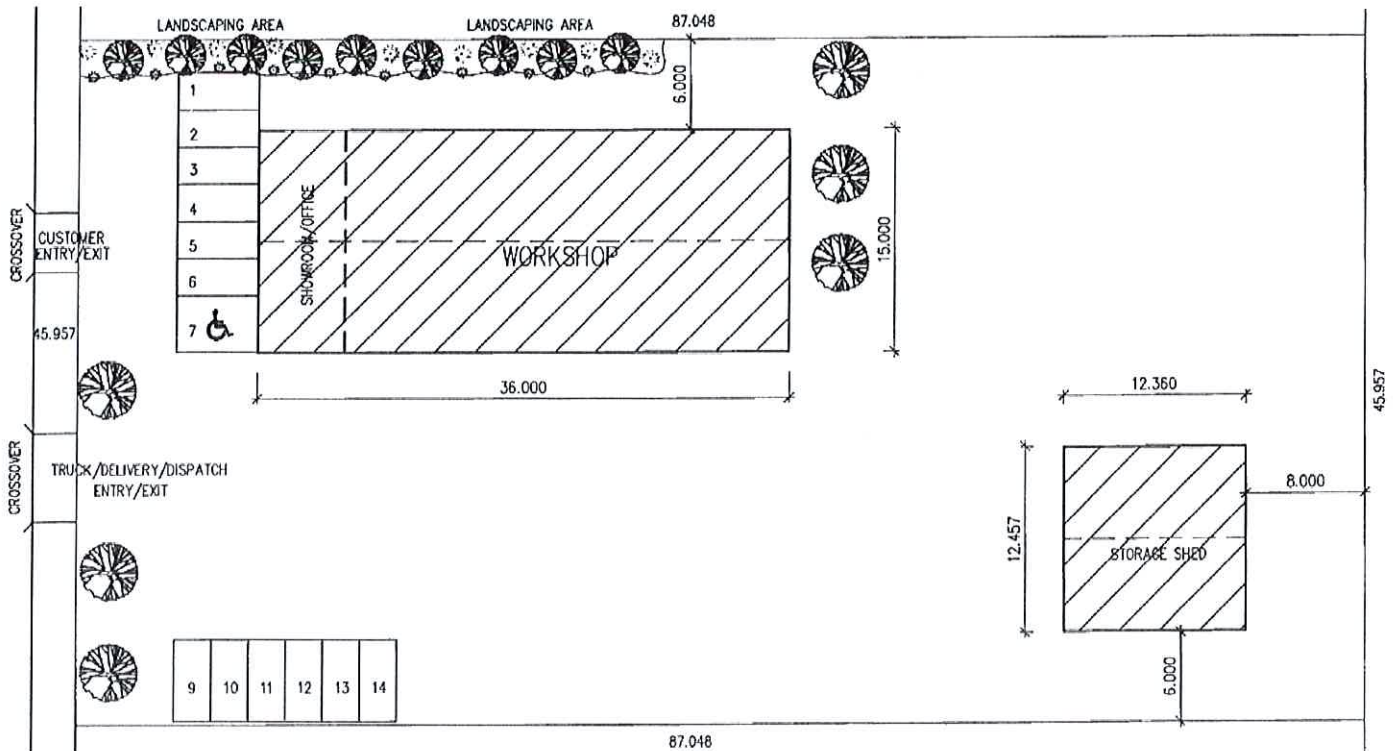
PROPOSED SITE PLAN (extract from proposal plans)
